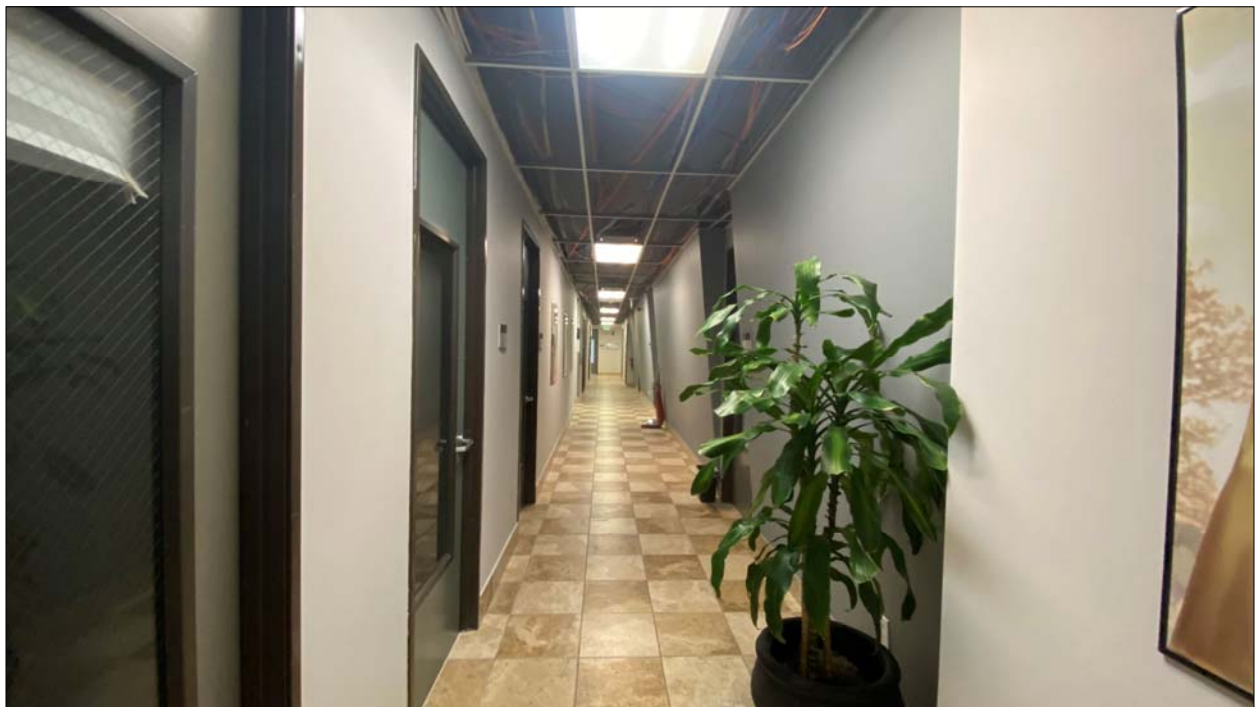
1149 Gower Street, interior, typical second floor corridor (Snow, 2021)
